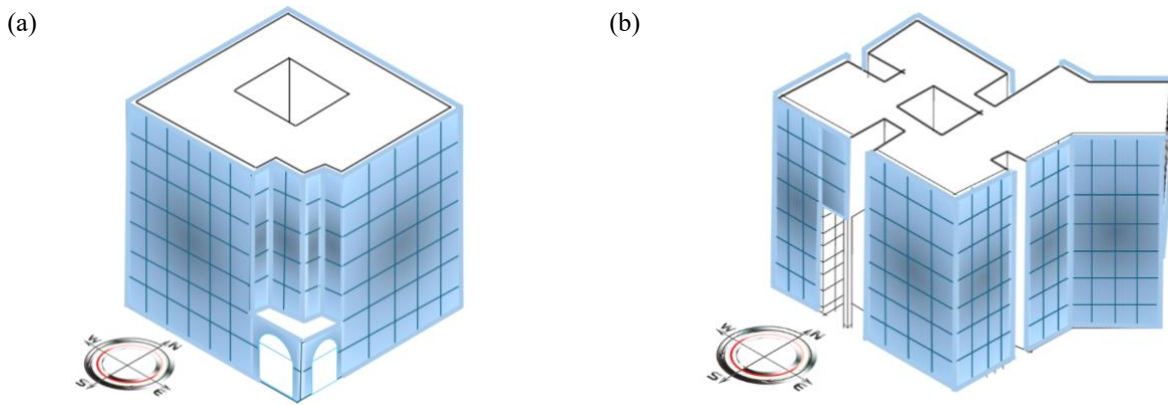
Integration of PV panels into the facades of the buildings studied (Source: Author).
